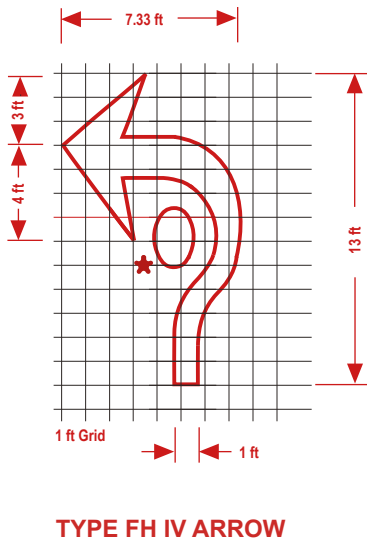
C-2 (CA). Lane - Use Arrow Pavement Marking Option for Roundabout Approaches
